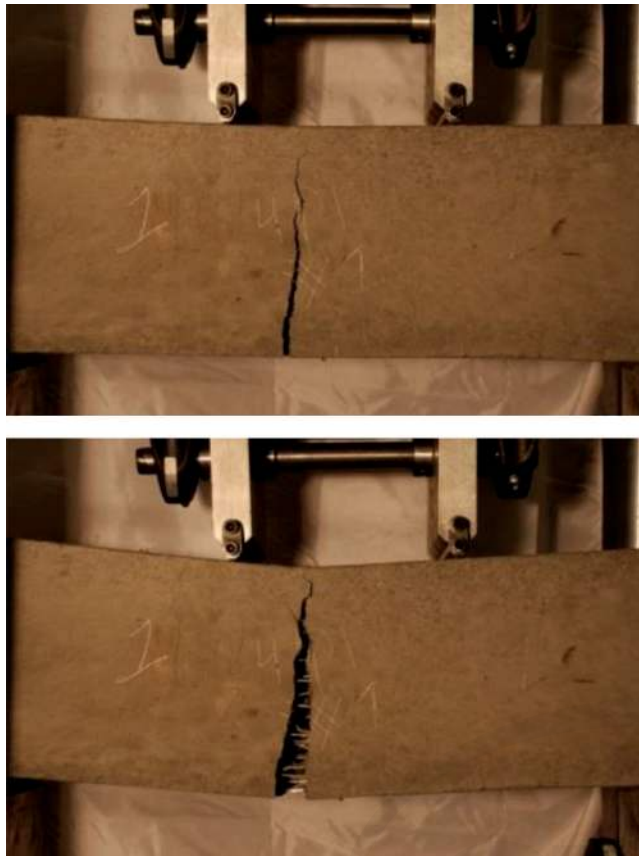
Crack control (bridging) in FRC beam under flexural loading. Note that in a standard test, the crack width is limited to approximately 0.12 in. (3 mm), whereas this beam was additionally loaded to show crack control at wide crack widths up to 1 in. (25 mm).
